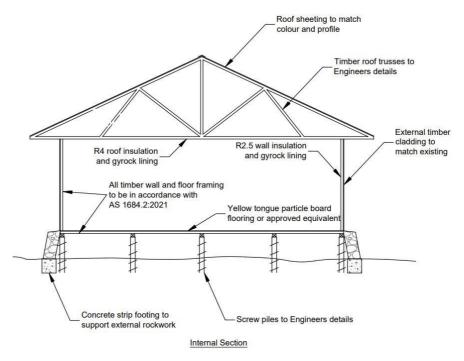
| Cross section of typical works (Source: Applicant's documentation)
